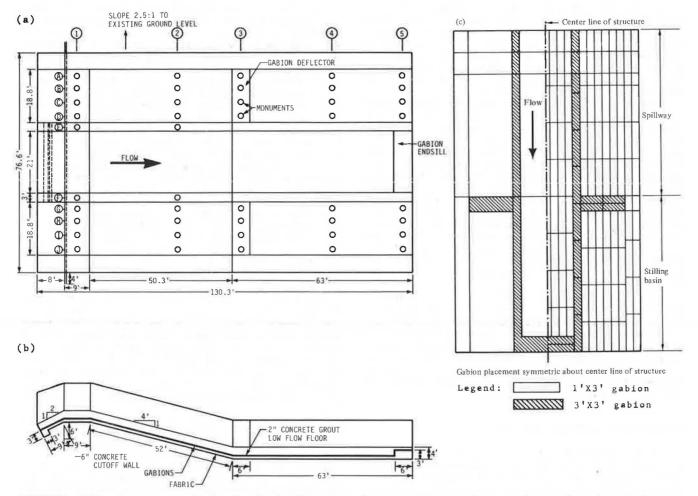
Gabion drop structure: (a) plan view showing dimensions and monument location, (b) section showing dimensions, (c) plan view showing gabion arrangement.
